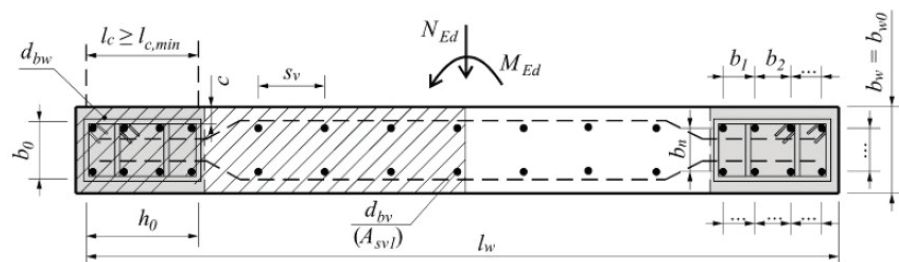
Rectangular cross-section RC wall with boundary elements (M1), (acc. to Milev J., 2016)
